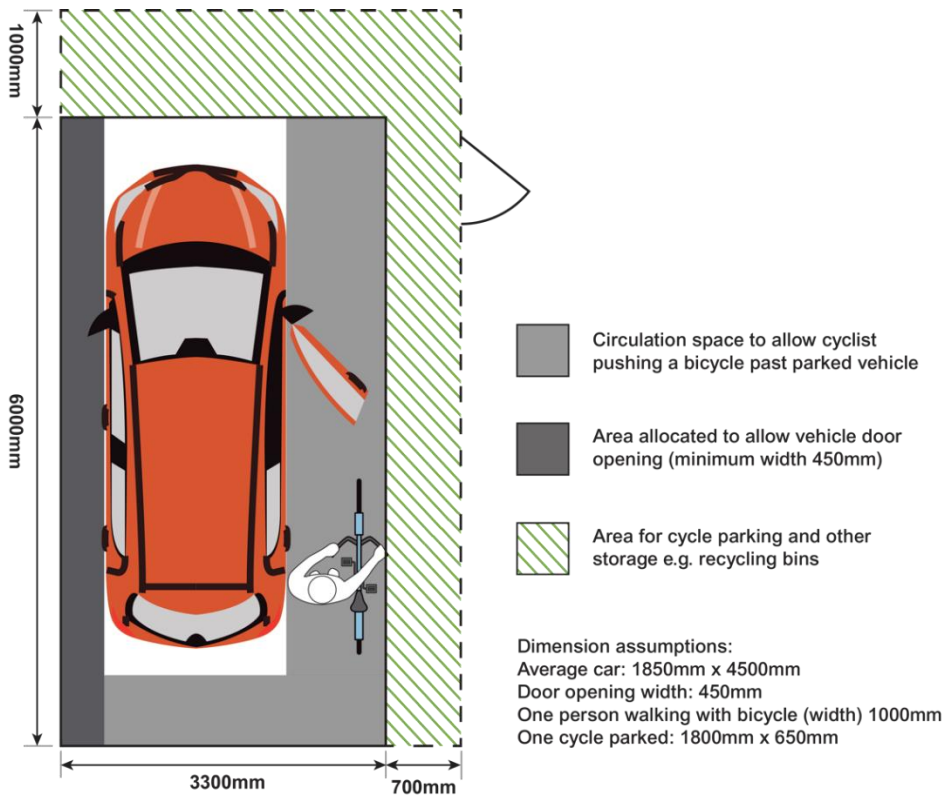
Minimum garage dimensions where parking for 5 cycles is also provided
